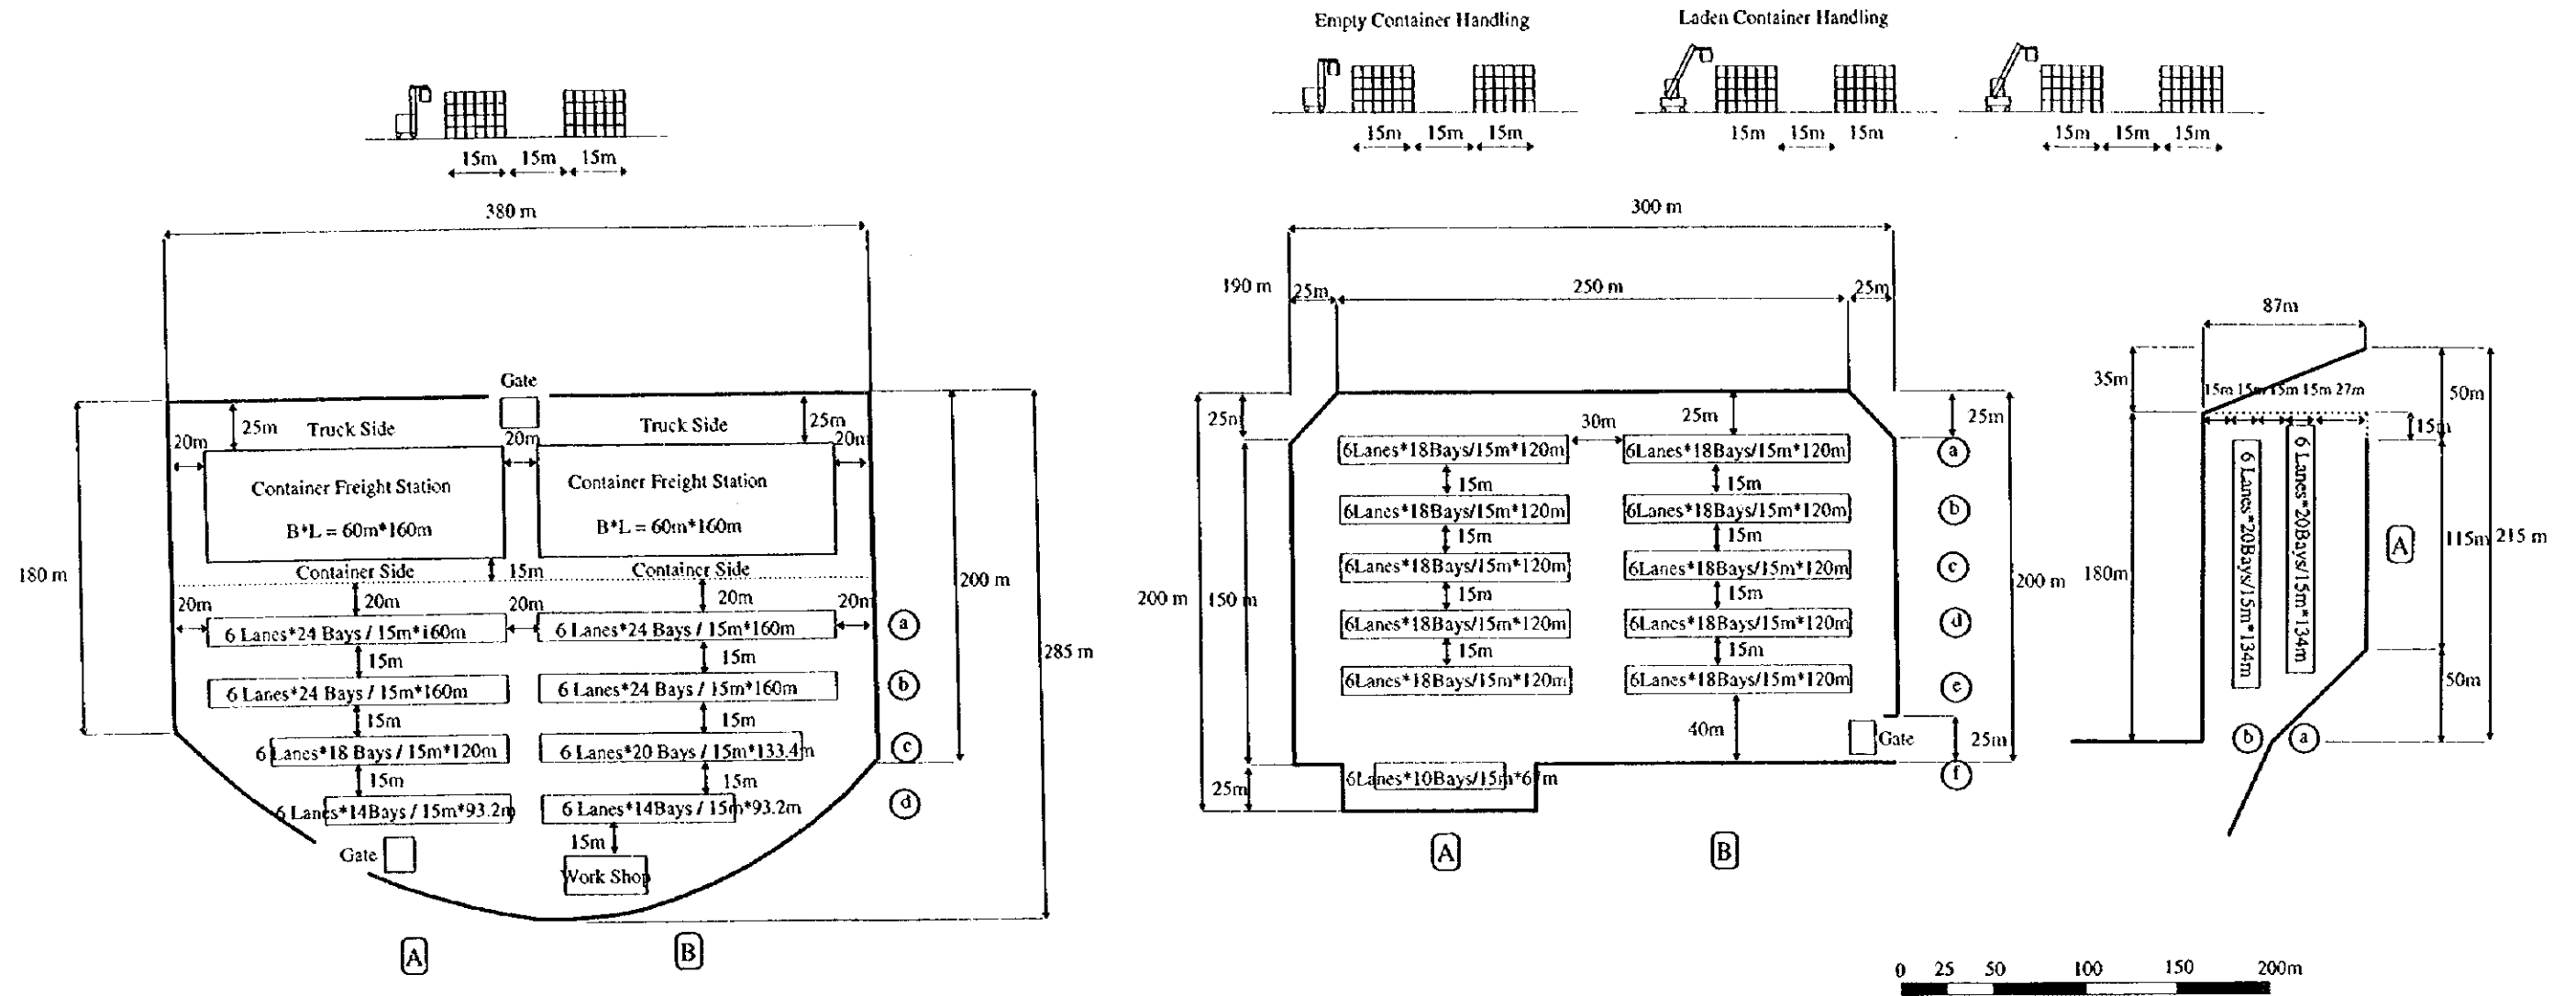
Layout Plan of Off-Dock Container Depot
